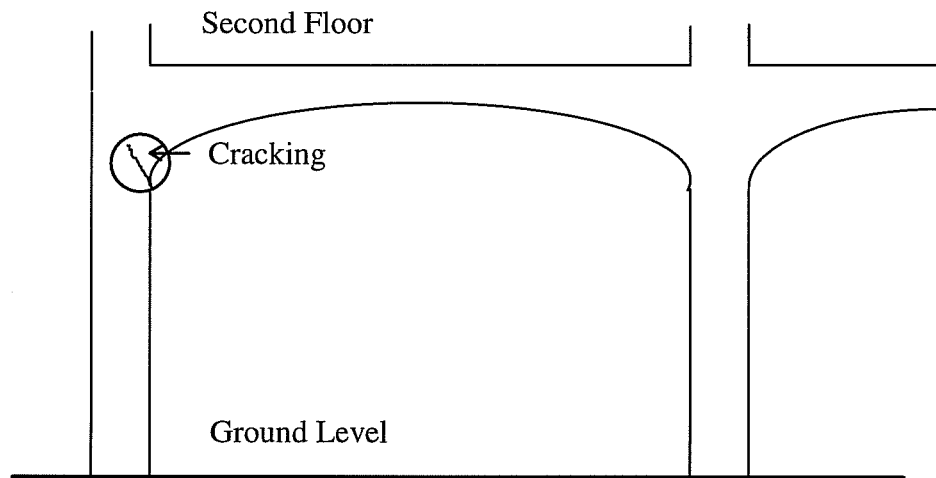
Cracking Pattern at the Second Floor Beam-Column Joint on the North Side (East-End) of the Structure
